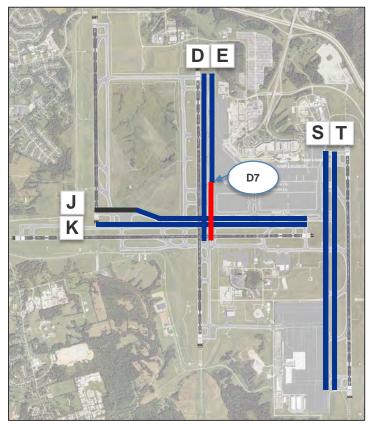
SUMMARY OF TAXIWAY PAVEMENT GEOMETRY IMPROVEMENTS – WEST
